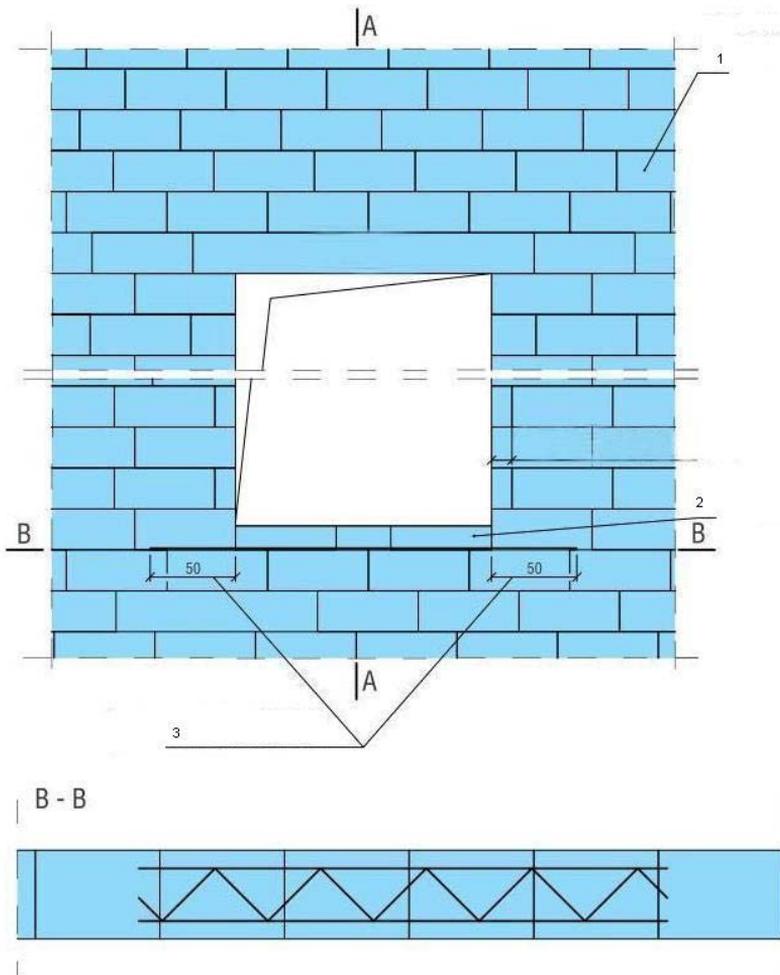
Rearming part of a wall under a windowsill with reinforcement.
